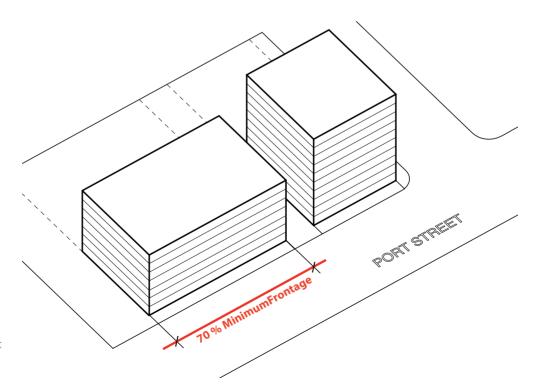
A minimum of 70% of the building shall front onto Port Street East and be within 0.6 m to 3.0 m.
